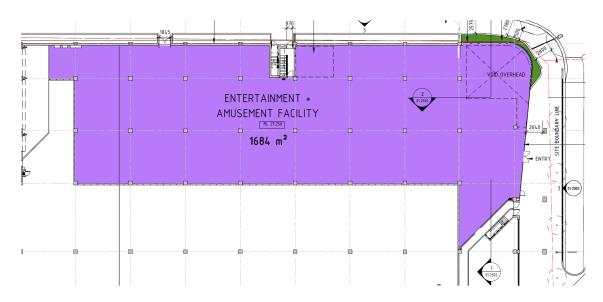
Floor Plan for Entertainment + Amusement Facility
